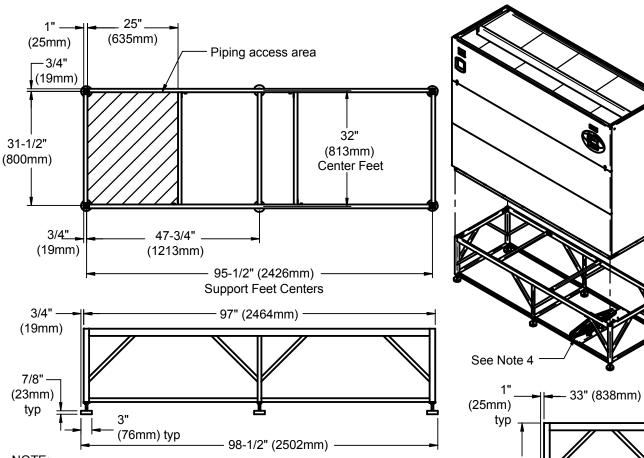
Floor stand and floor planning dimensions, downflow models CW076 and CW084 with EC fans
